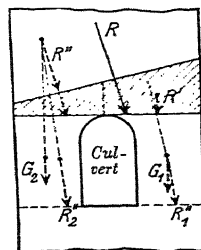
Static investigation of a cross-section of the wall which is weakened by the insertion of a culvert.
